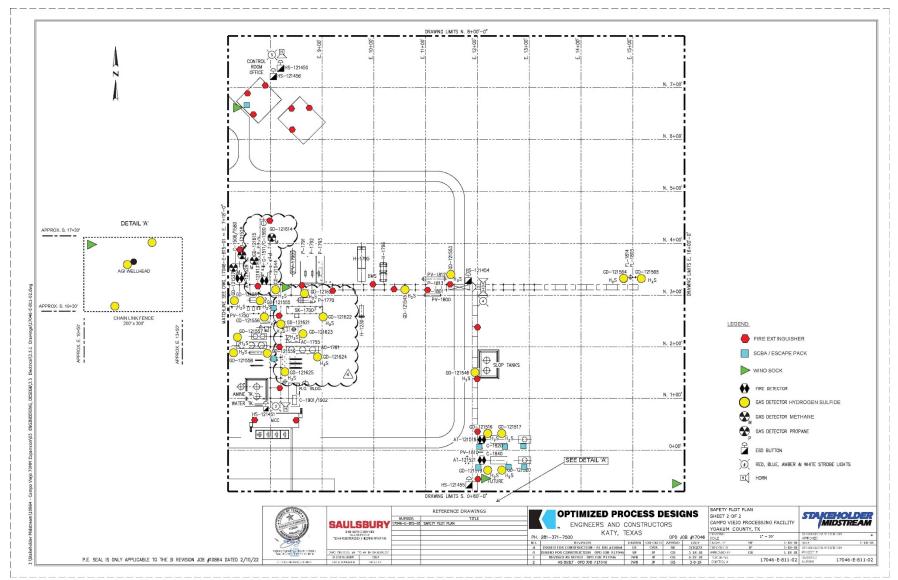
Site Plan, Campo Viejo Facility and PAV #1 – East Section
